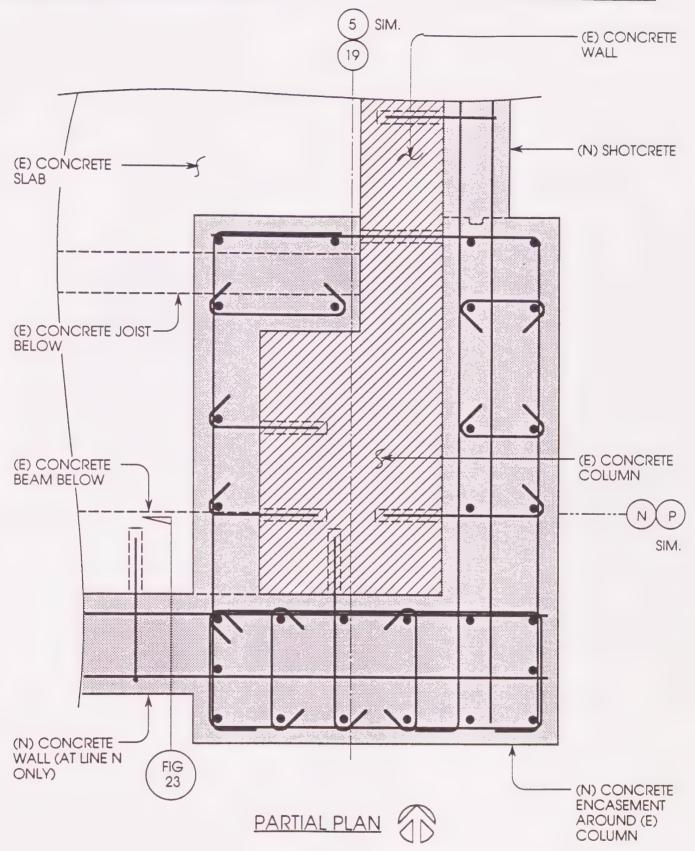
Retrofit Scheme - Typical Corner Column at Tower
